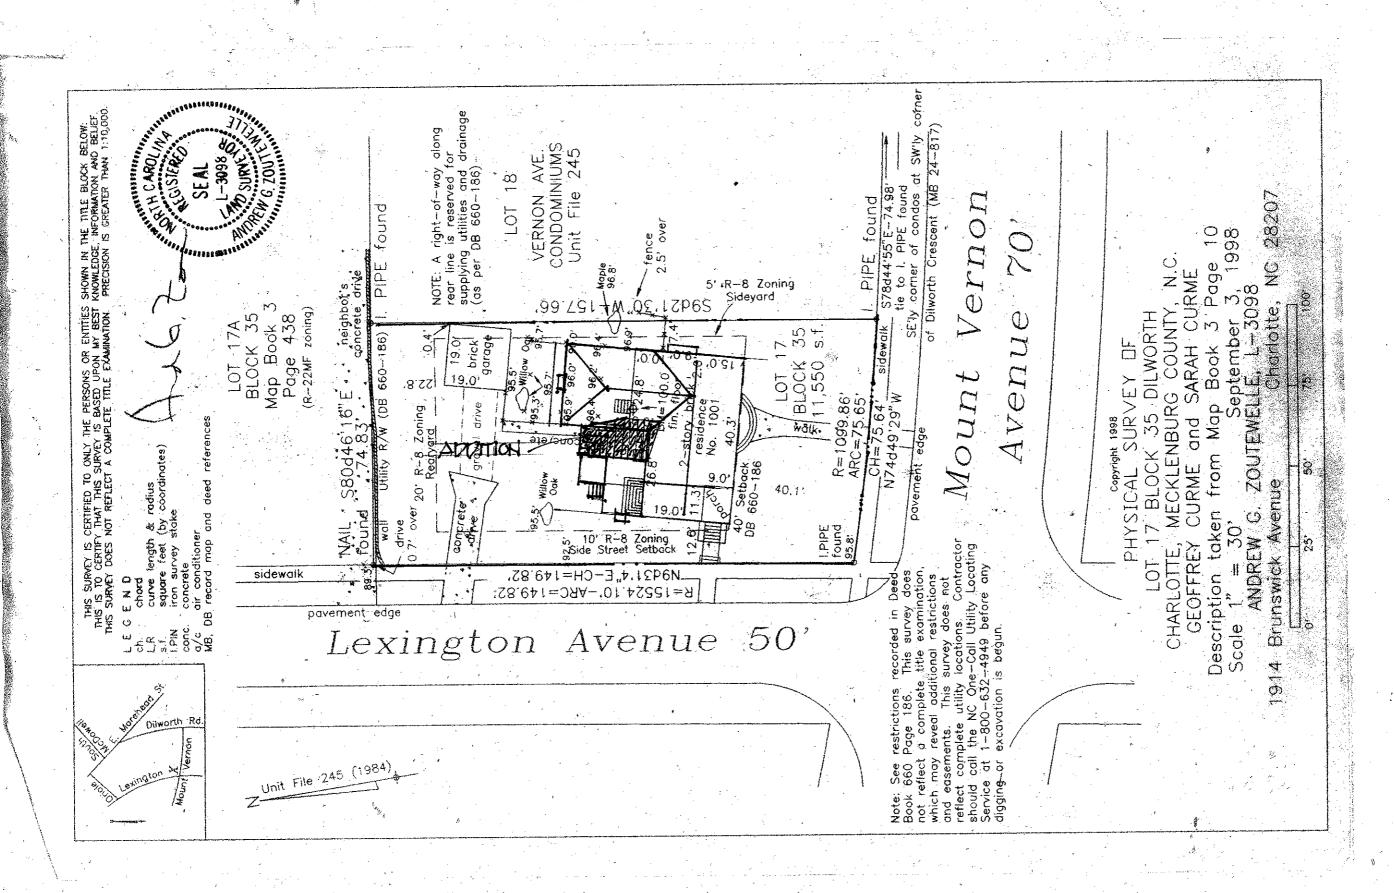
DETAILS OF APPROVED PROJECT: The project is a two story rear addition that will be partially visible from the street. The material is brick. Windows and trim details will match existing. The roof will be copper. See attached plans and notes.
